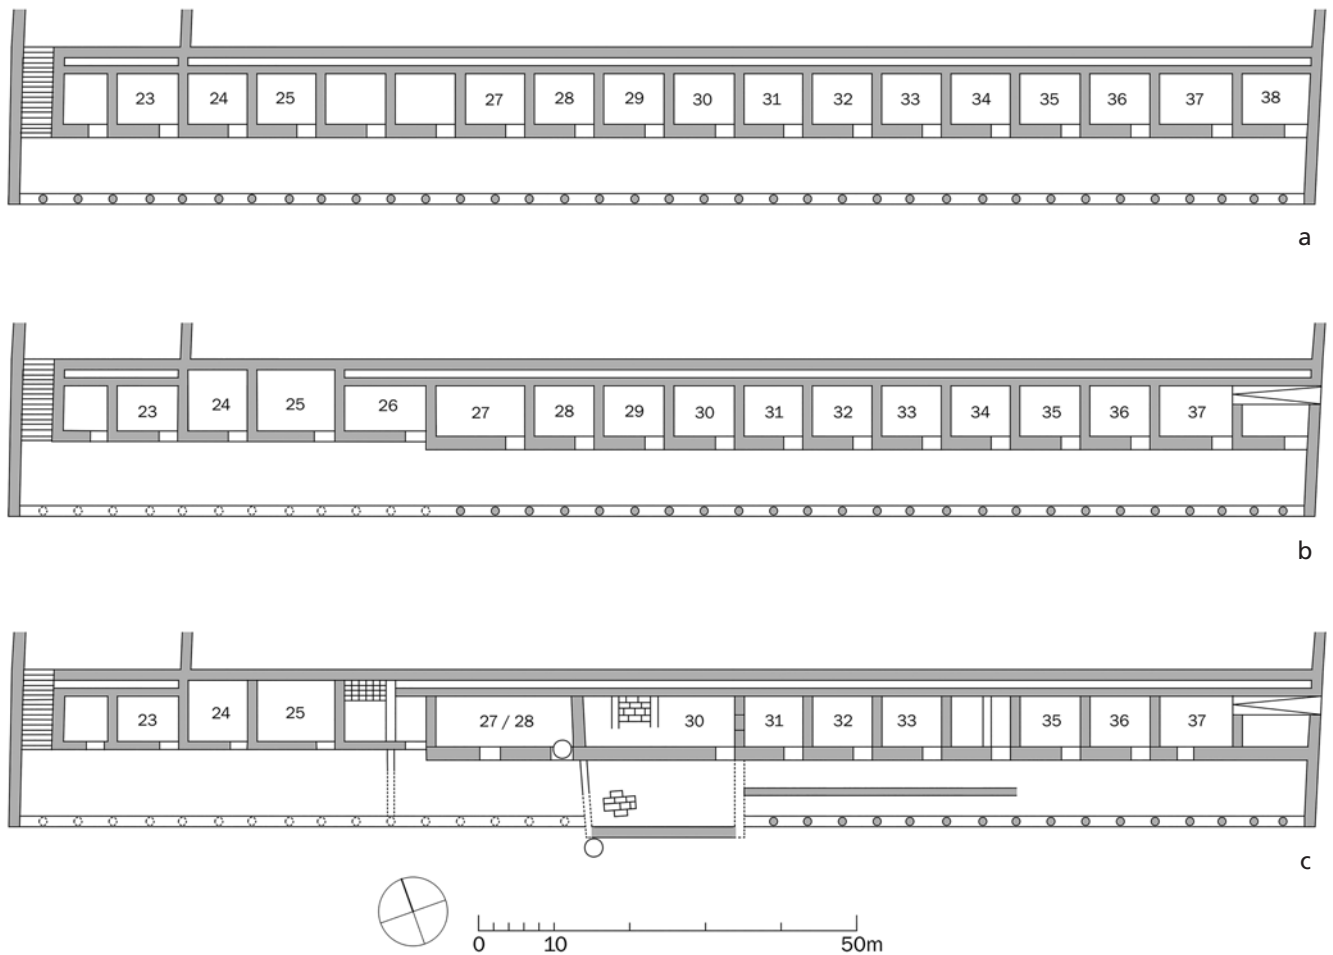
Pergamon, Lower Agora. Development of southern wing: a alleged original layout (phase I). – b rebuilding of back wall between rooms 23 and 26 (phase II). – c installation of smaller units by means of subdivision and further installations (phase III). – (Draft B. Emme).
